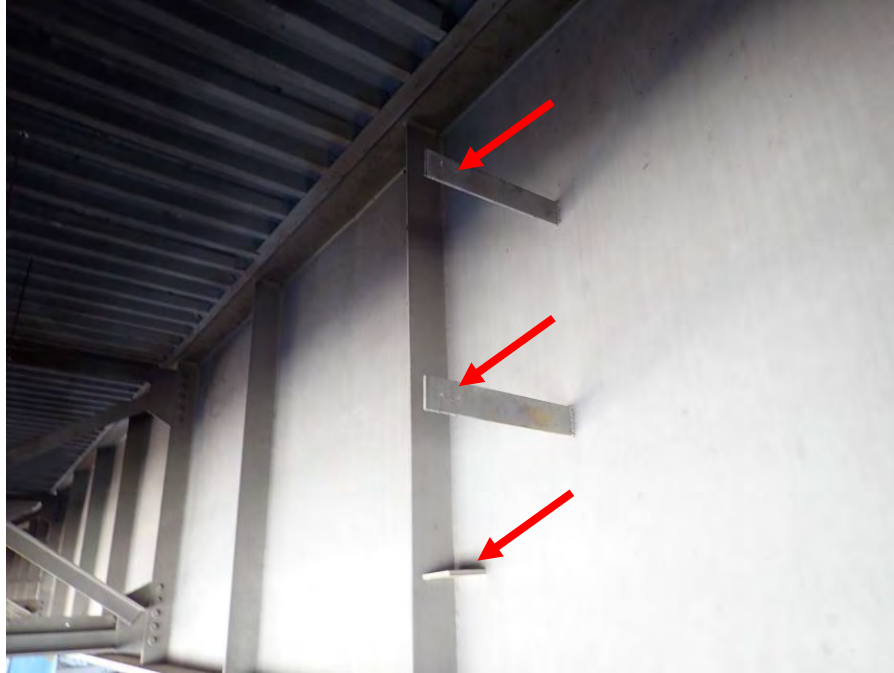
Girder Top Flange Connection Fasteners Missing above the Pin and Hanger Connections – Girder 16 at Bent 11 Shown, Looking North
